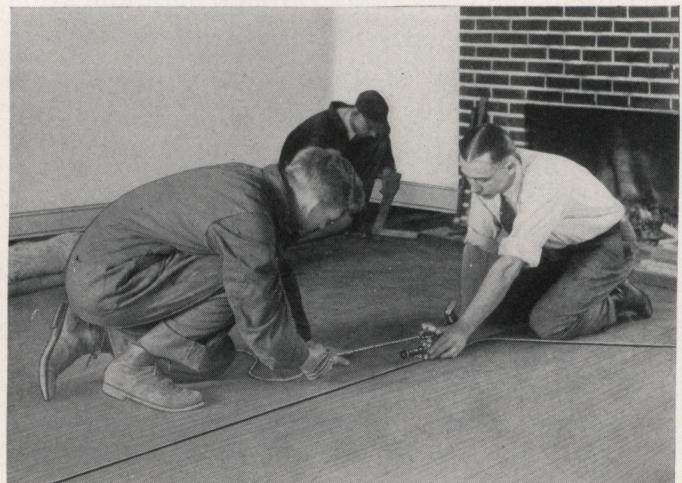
Cutting a linoleum seam. In pasting, the edges of adjoining linoleum strips are overlapped. Then with the seam cutting tool the overlap is cut through to make a close fitting, practically invisible seam.
